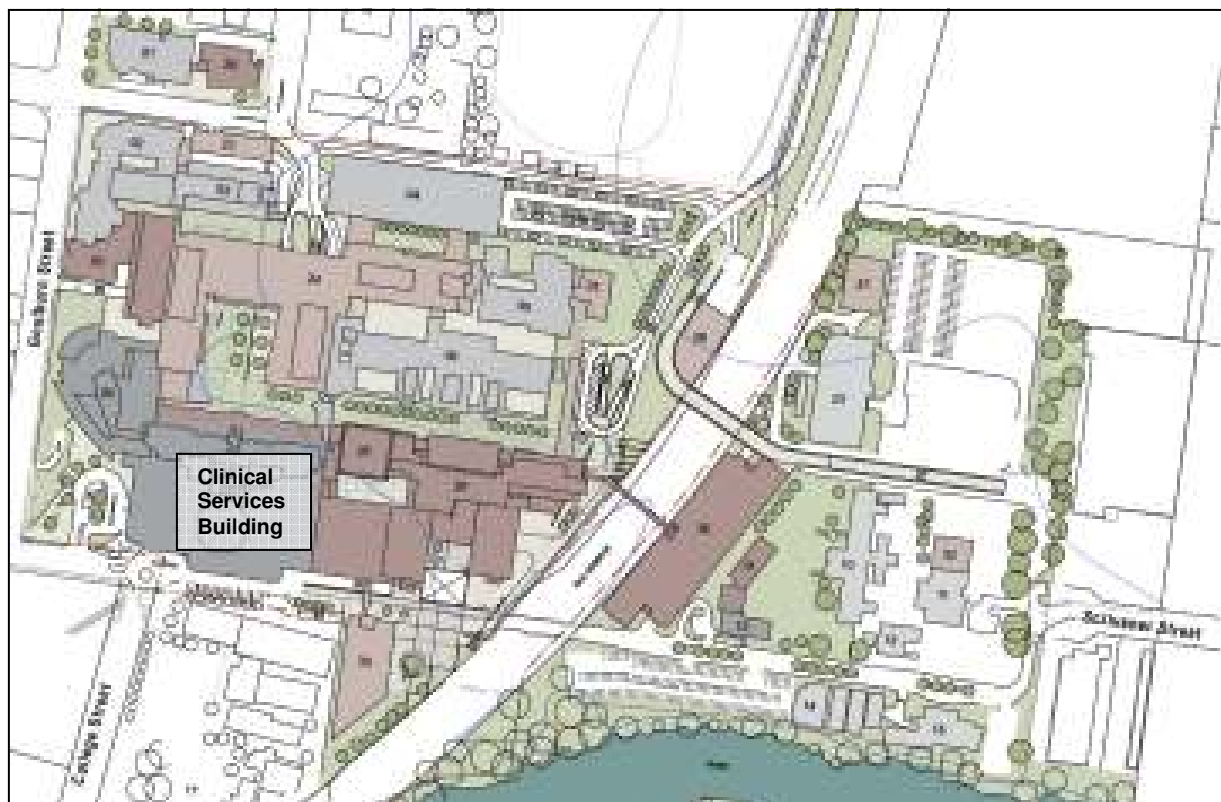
Approved Concept Plan with existing buildings in grey and proposed buildings in brown.
